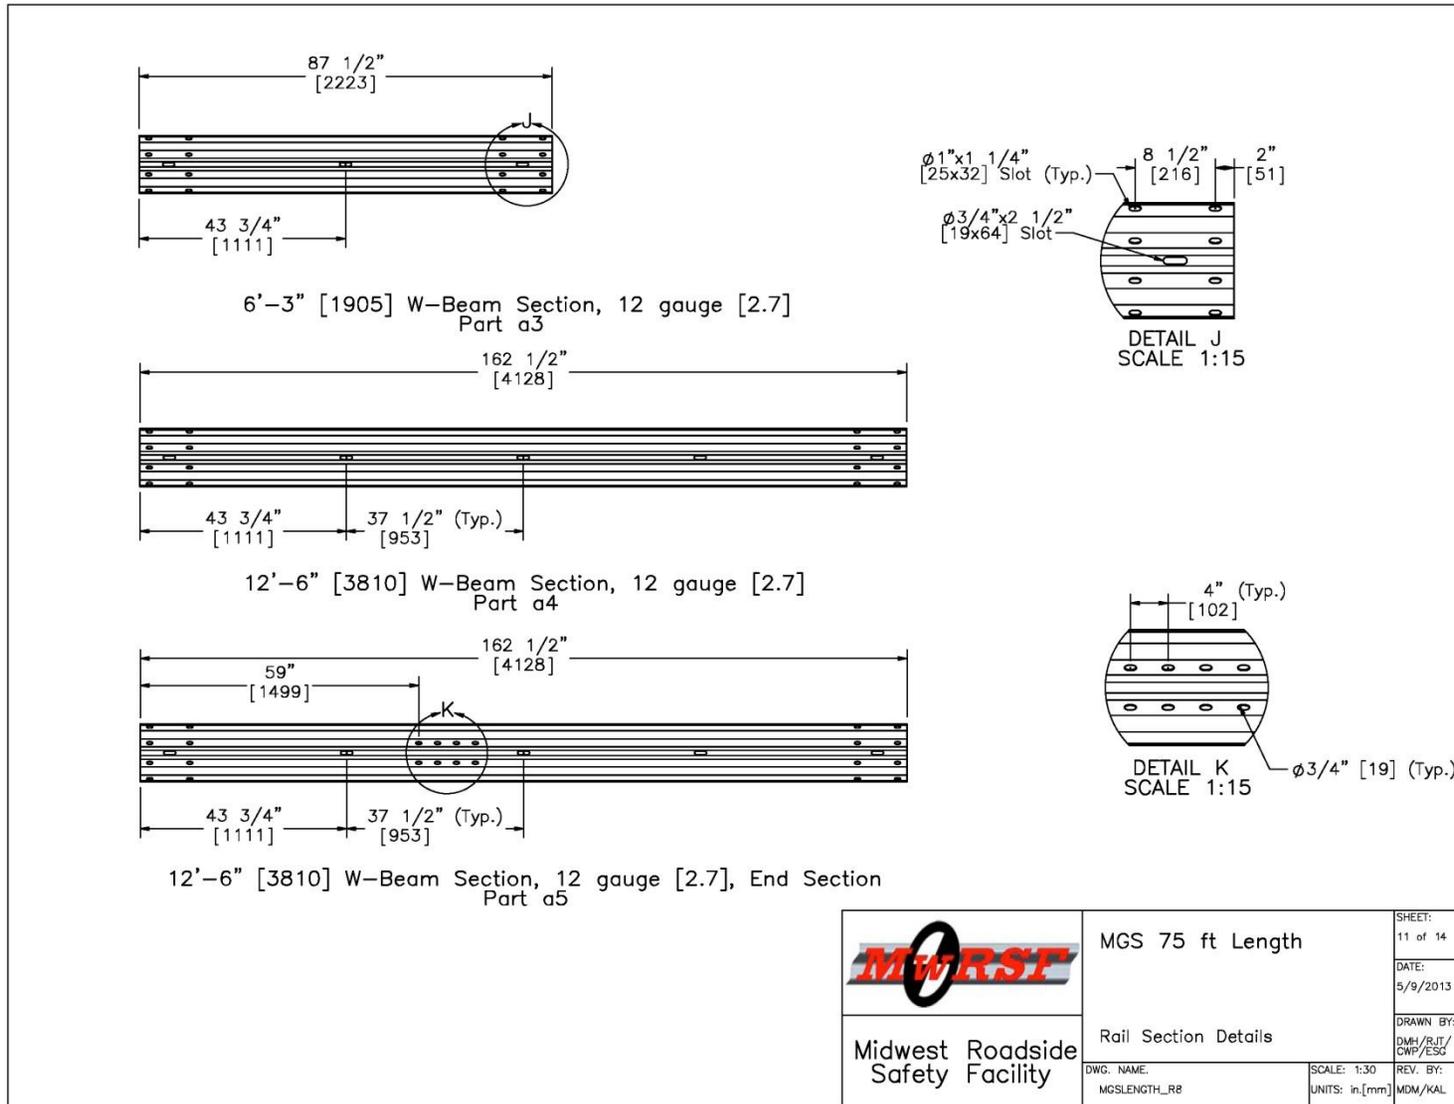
W-Beam Guardrail Details, Test No. MGSMIN-1
